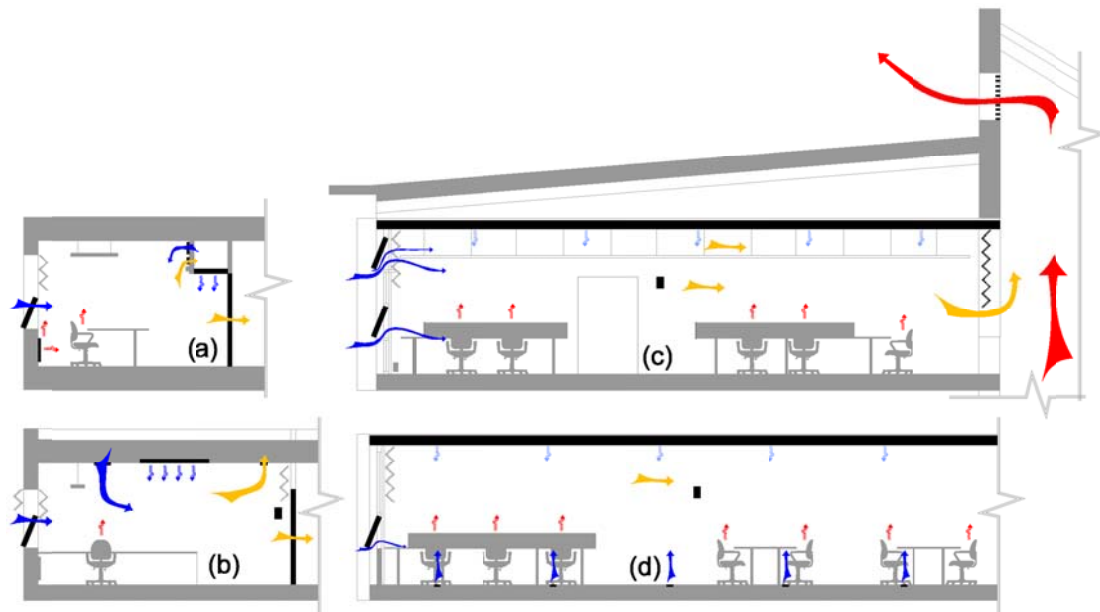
Summer day ventilation sections (a) Building A, (b) Building B, (c) Building C, and (d) Building D
